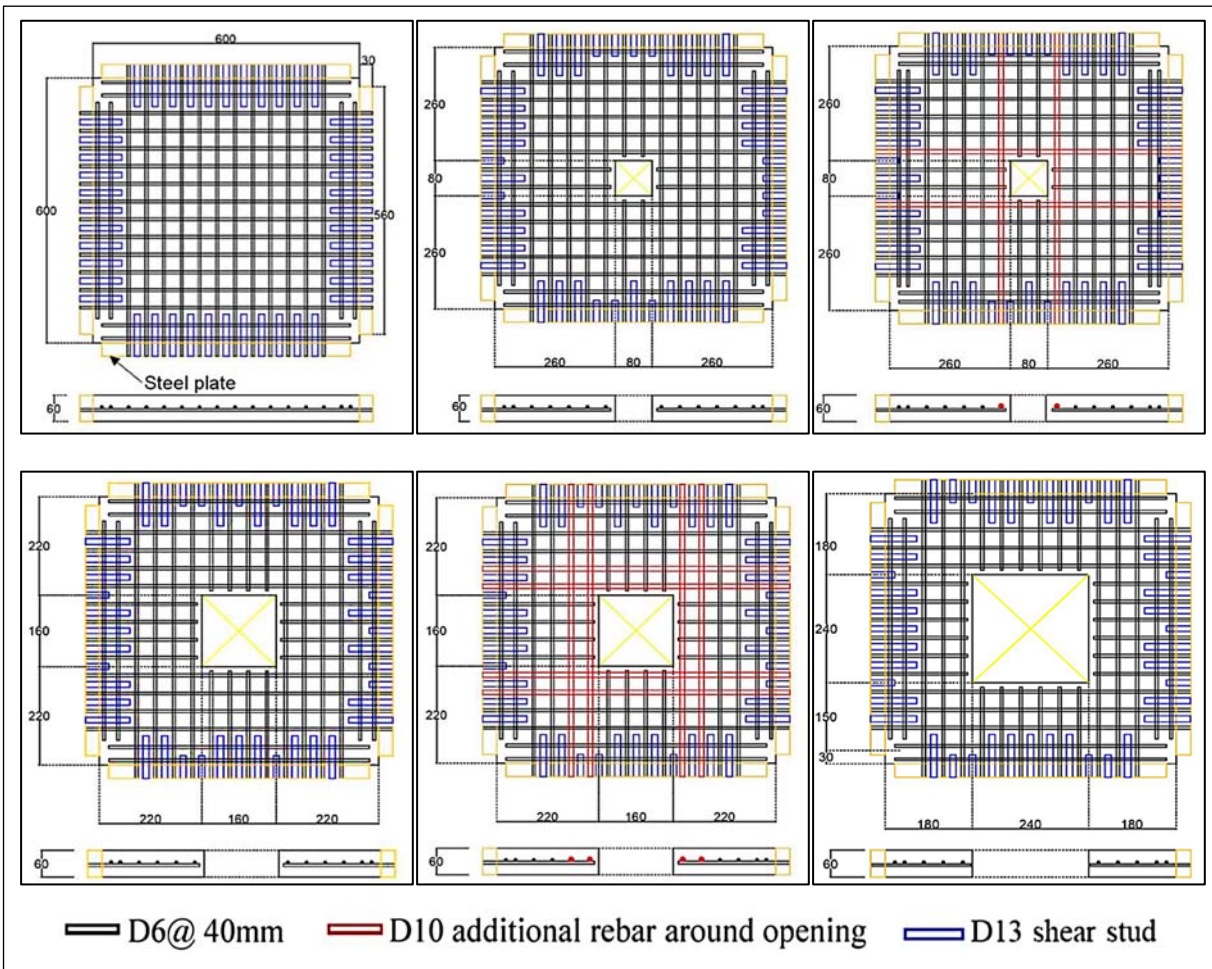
Dimensions and reinforcing details of six RC wall test specimens (in mm).
